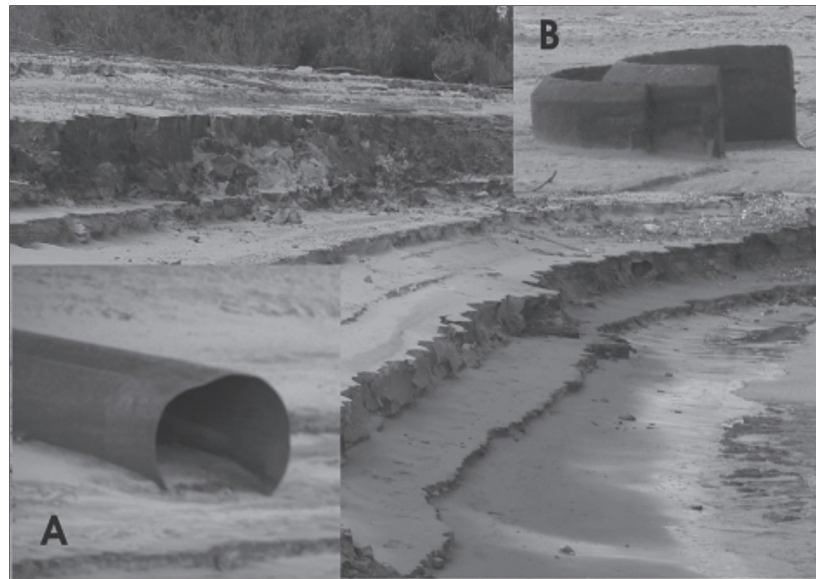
The river bank during summer water lowstand shows exposed part of bottom, which consists from alternating layers of mostly sandy to silty sediments. A- fragment of build pipe by about 1m diameter; B- sinking load on the pipe.
